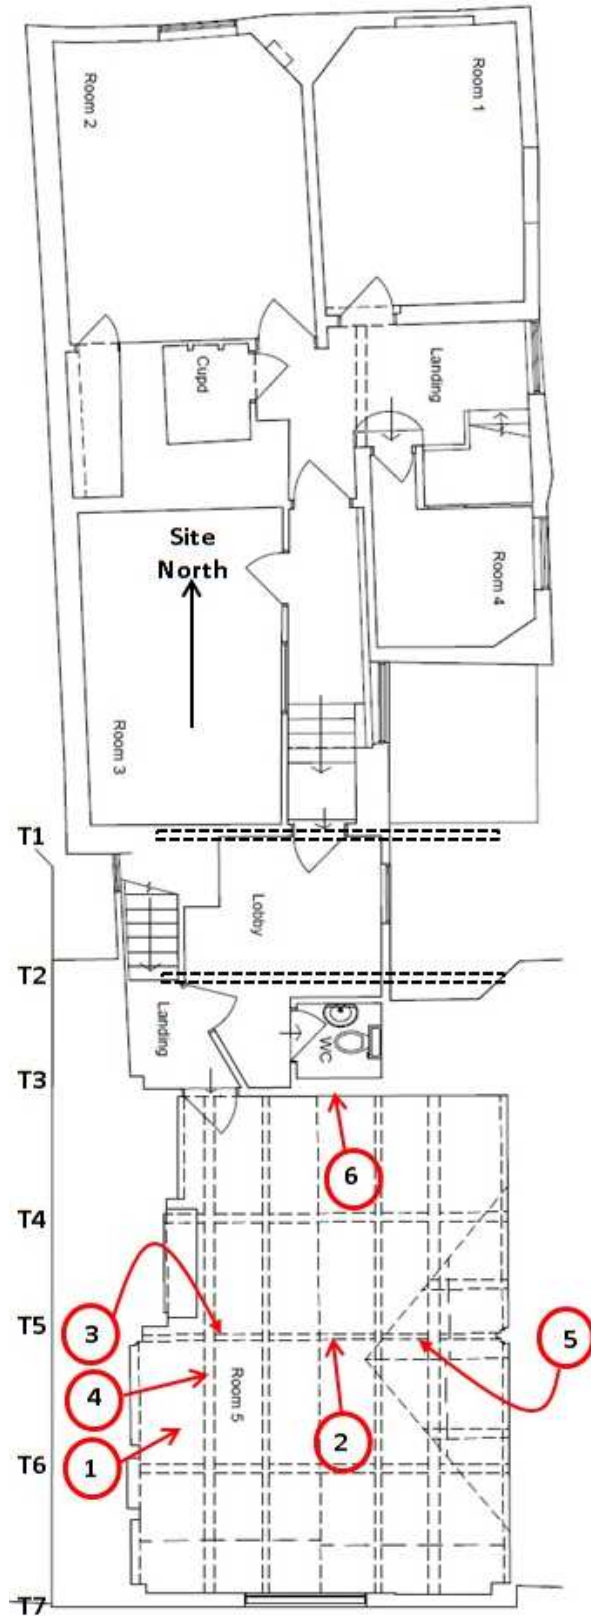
Plan to locate sampled roof timbers (after Nick Joyce Architects)
